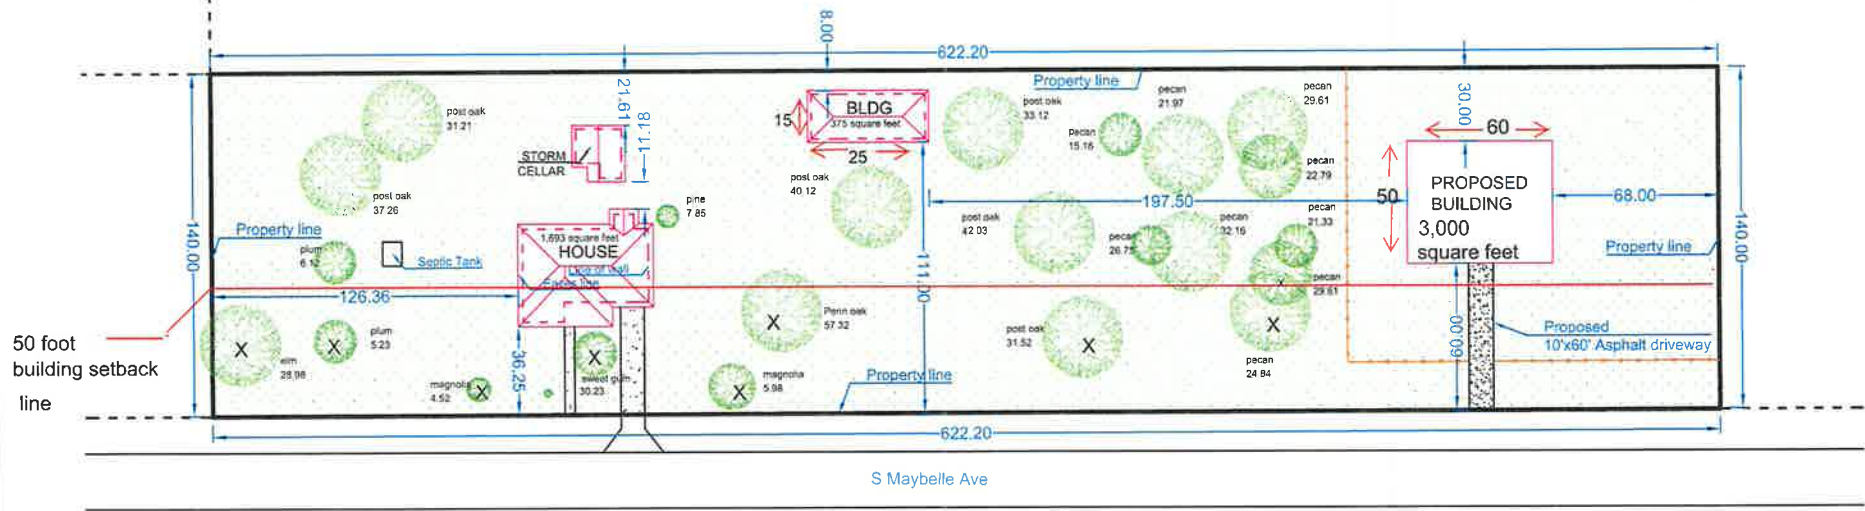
EXHIBIT FOR ALTERNATIVE COMPLIANCE LANDSCAPE PLAN
